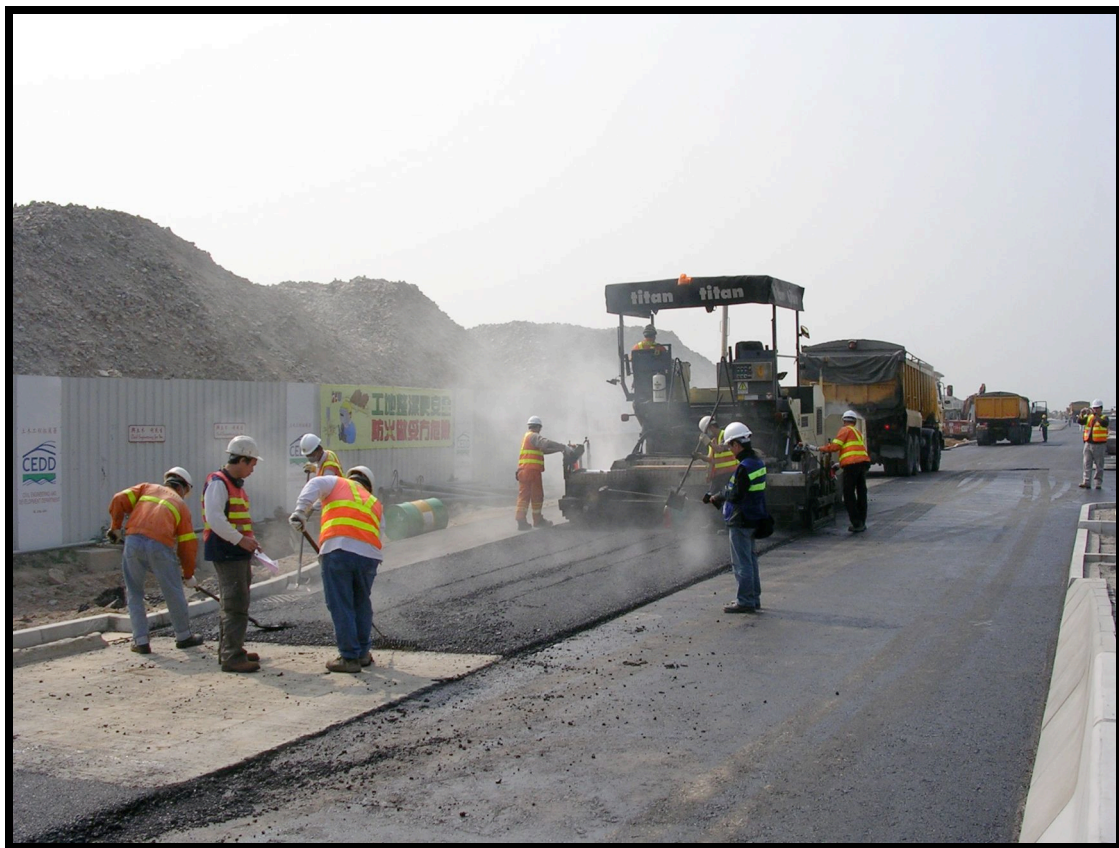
A rubberized asphalt road being constructed at the Hong Kong Eco-Park (also currently under construction).
